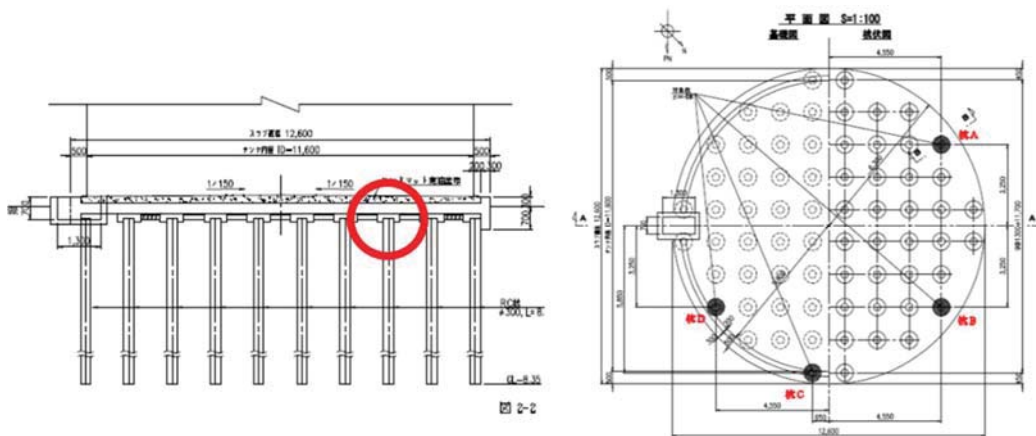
Pile connection in piled-foundation of oil tank (Ishimatsu et al., 2009).
